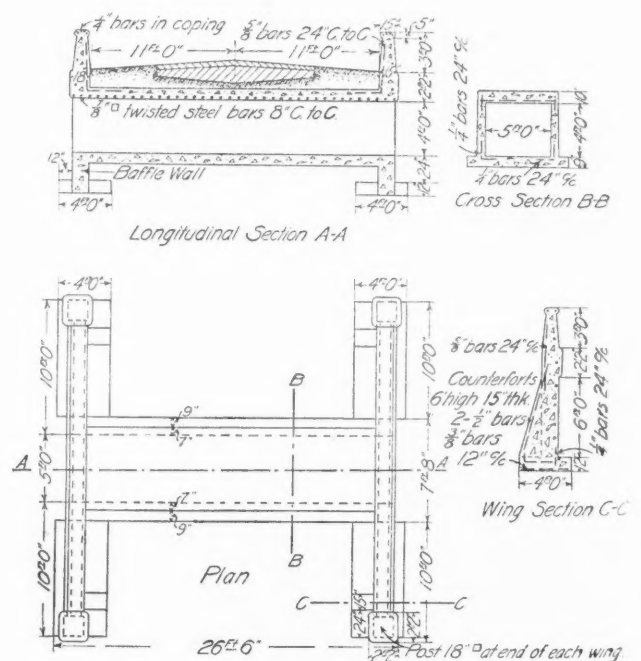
REINFORCED CONCRETE BOX CULVERT AT LENOX, MASS.
